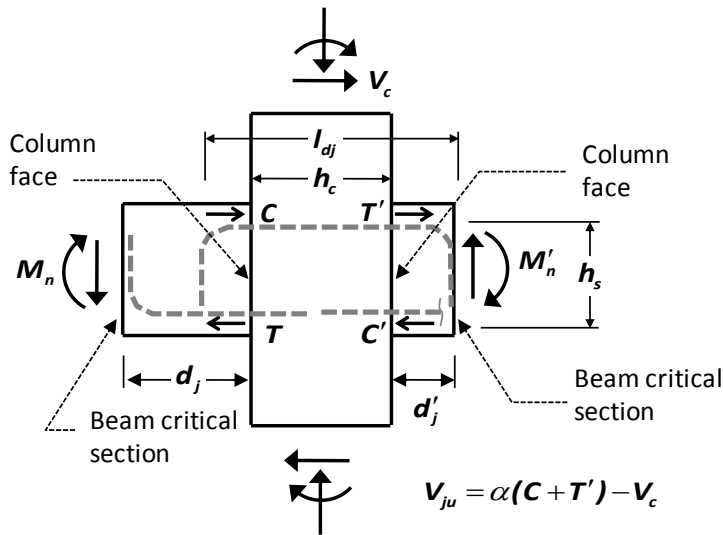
Shear demand of beam-column joint with strengthening bars
